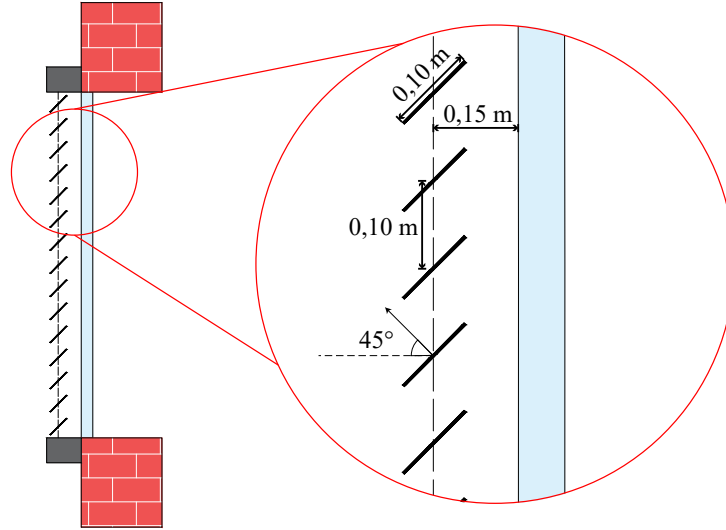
Cross-section of the shading system. The shading system does not in any way count as an overhang in the calculations.
